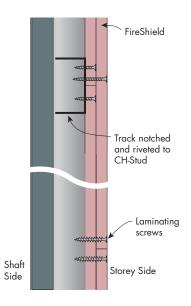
Alternate Butt Joint Detail in FireShield Elevation
